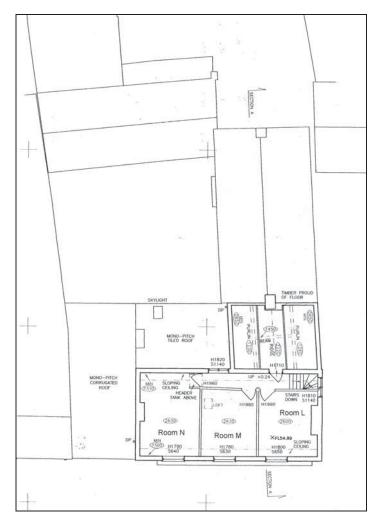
Second Floor plan (with letters L-N identifying rooms).
